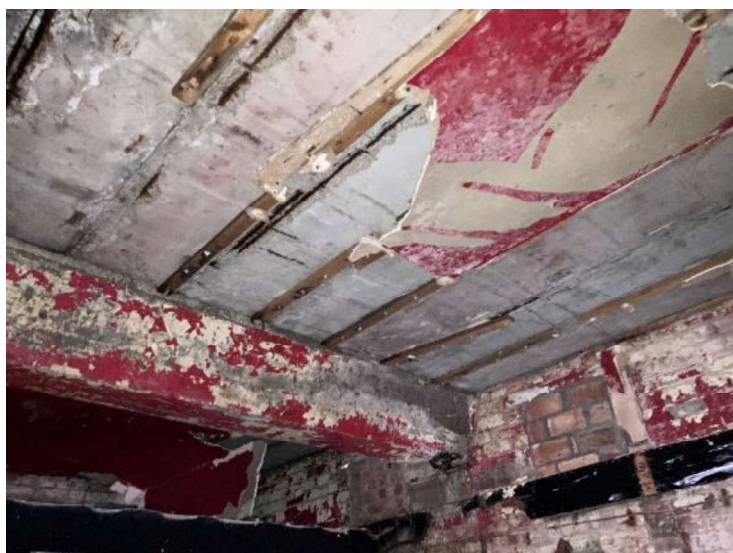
Corrosion of concrete exposing corroded steel reinforcement bars.
